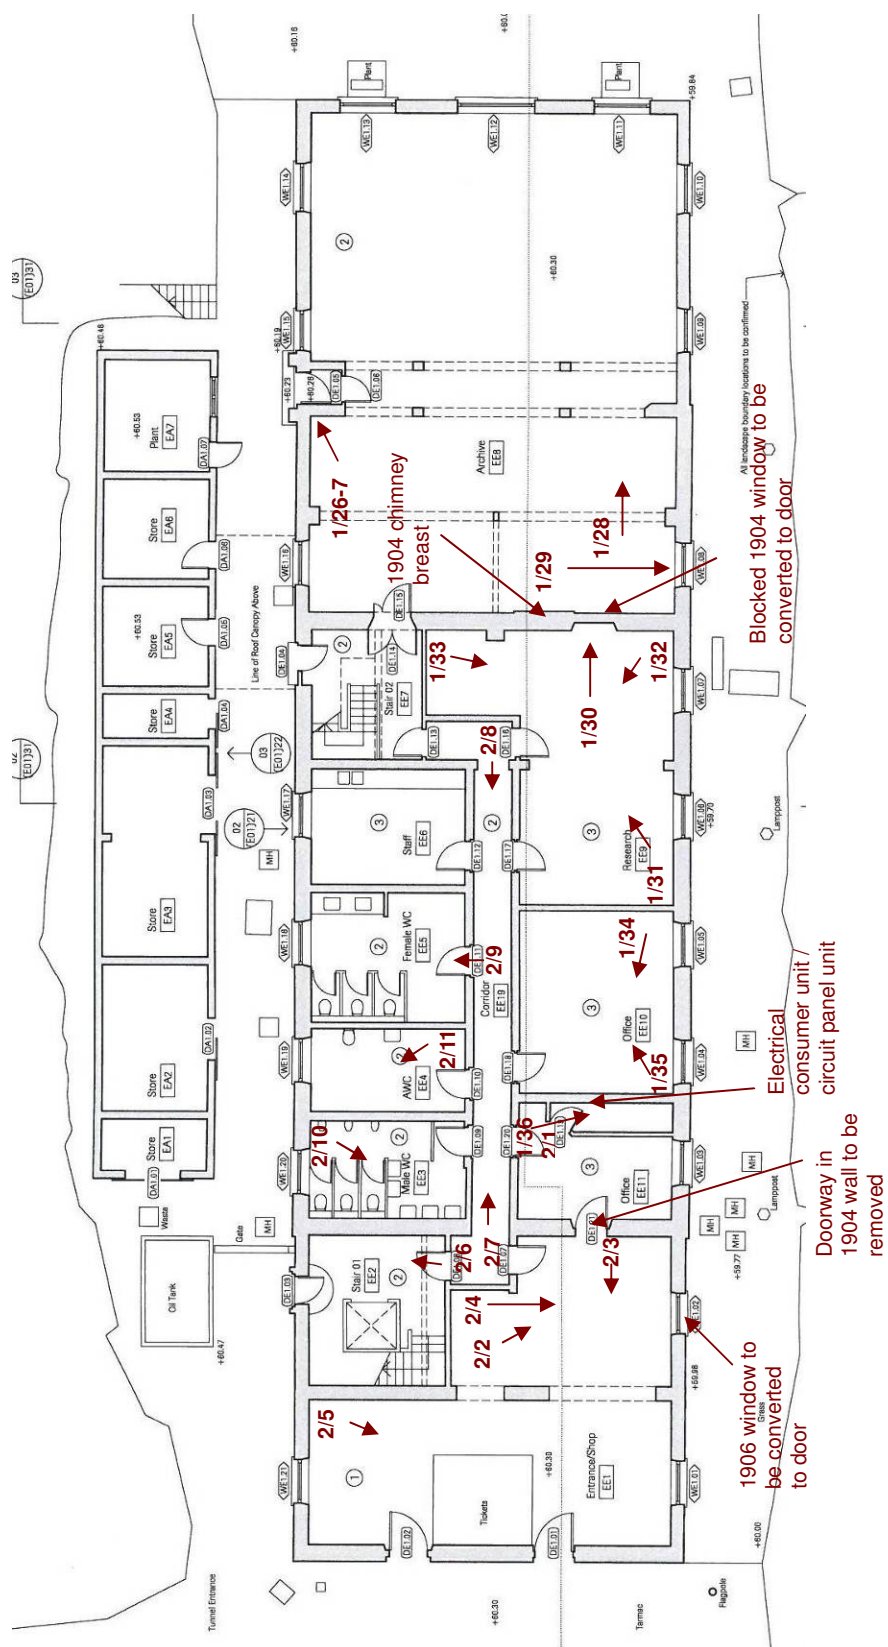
Eastern House (ground floor) – black & white photo locations and direction of shot, 13/02/2012 (Long & Kentish architects' base plan)
